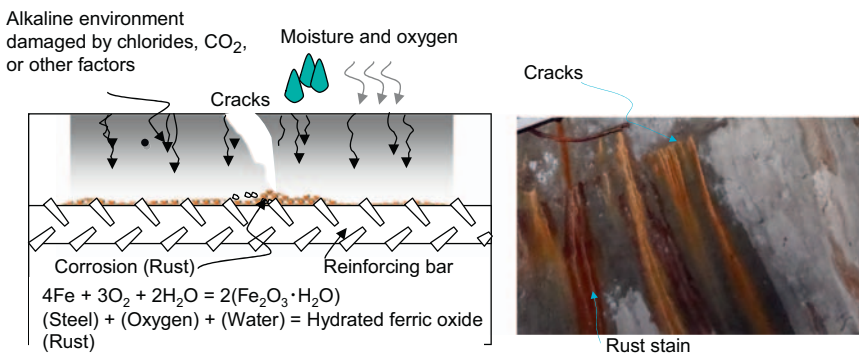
Steel reinforcement corrosion and tunnel deterioration example.
